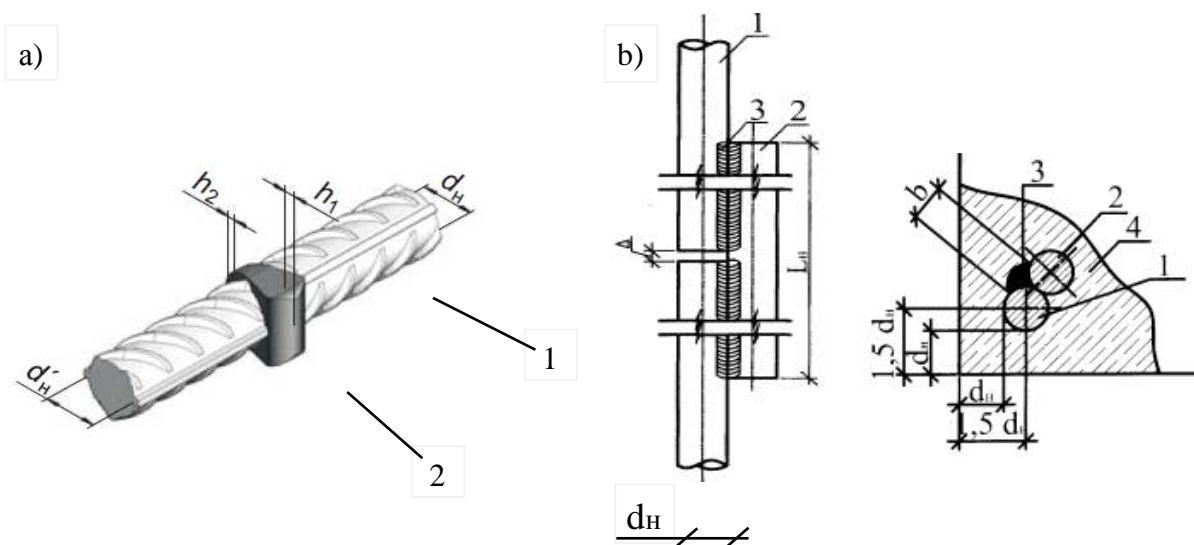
The design of the junction of rods longitudinal reinforcement columns with the use of welding bath:
